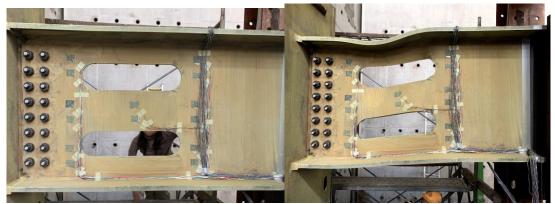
Photos of the RWS connection (T2); no obvious deformation at 2% drift (left), and buckling deformation in the upper beam flange and out of plane deformation of the reduced web section at 4% drift (right)
